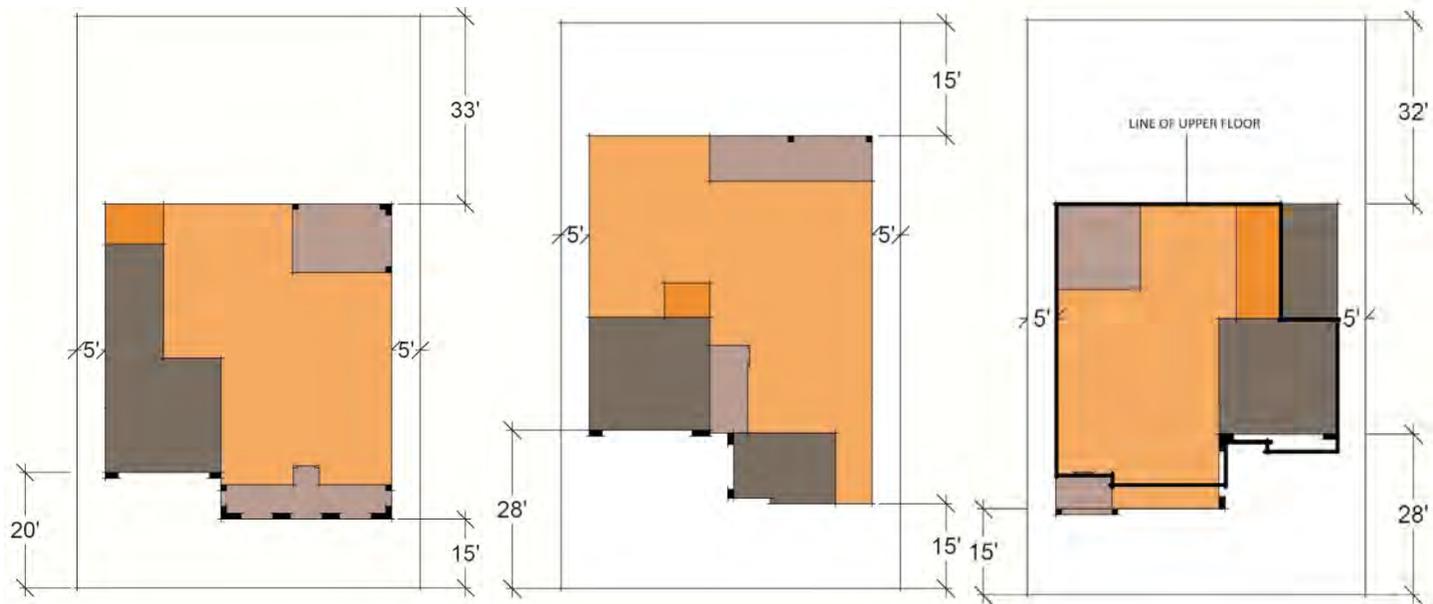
Floor Plan Diagram (60 x100 Lots) – *Sample layout, final may differ
